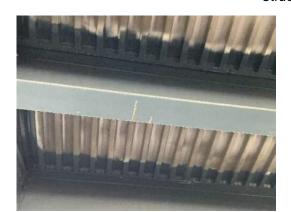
E-001: Impact damage to S5 bottom flange, between pier 9E and midspan
